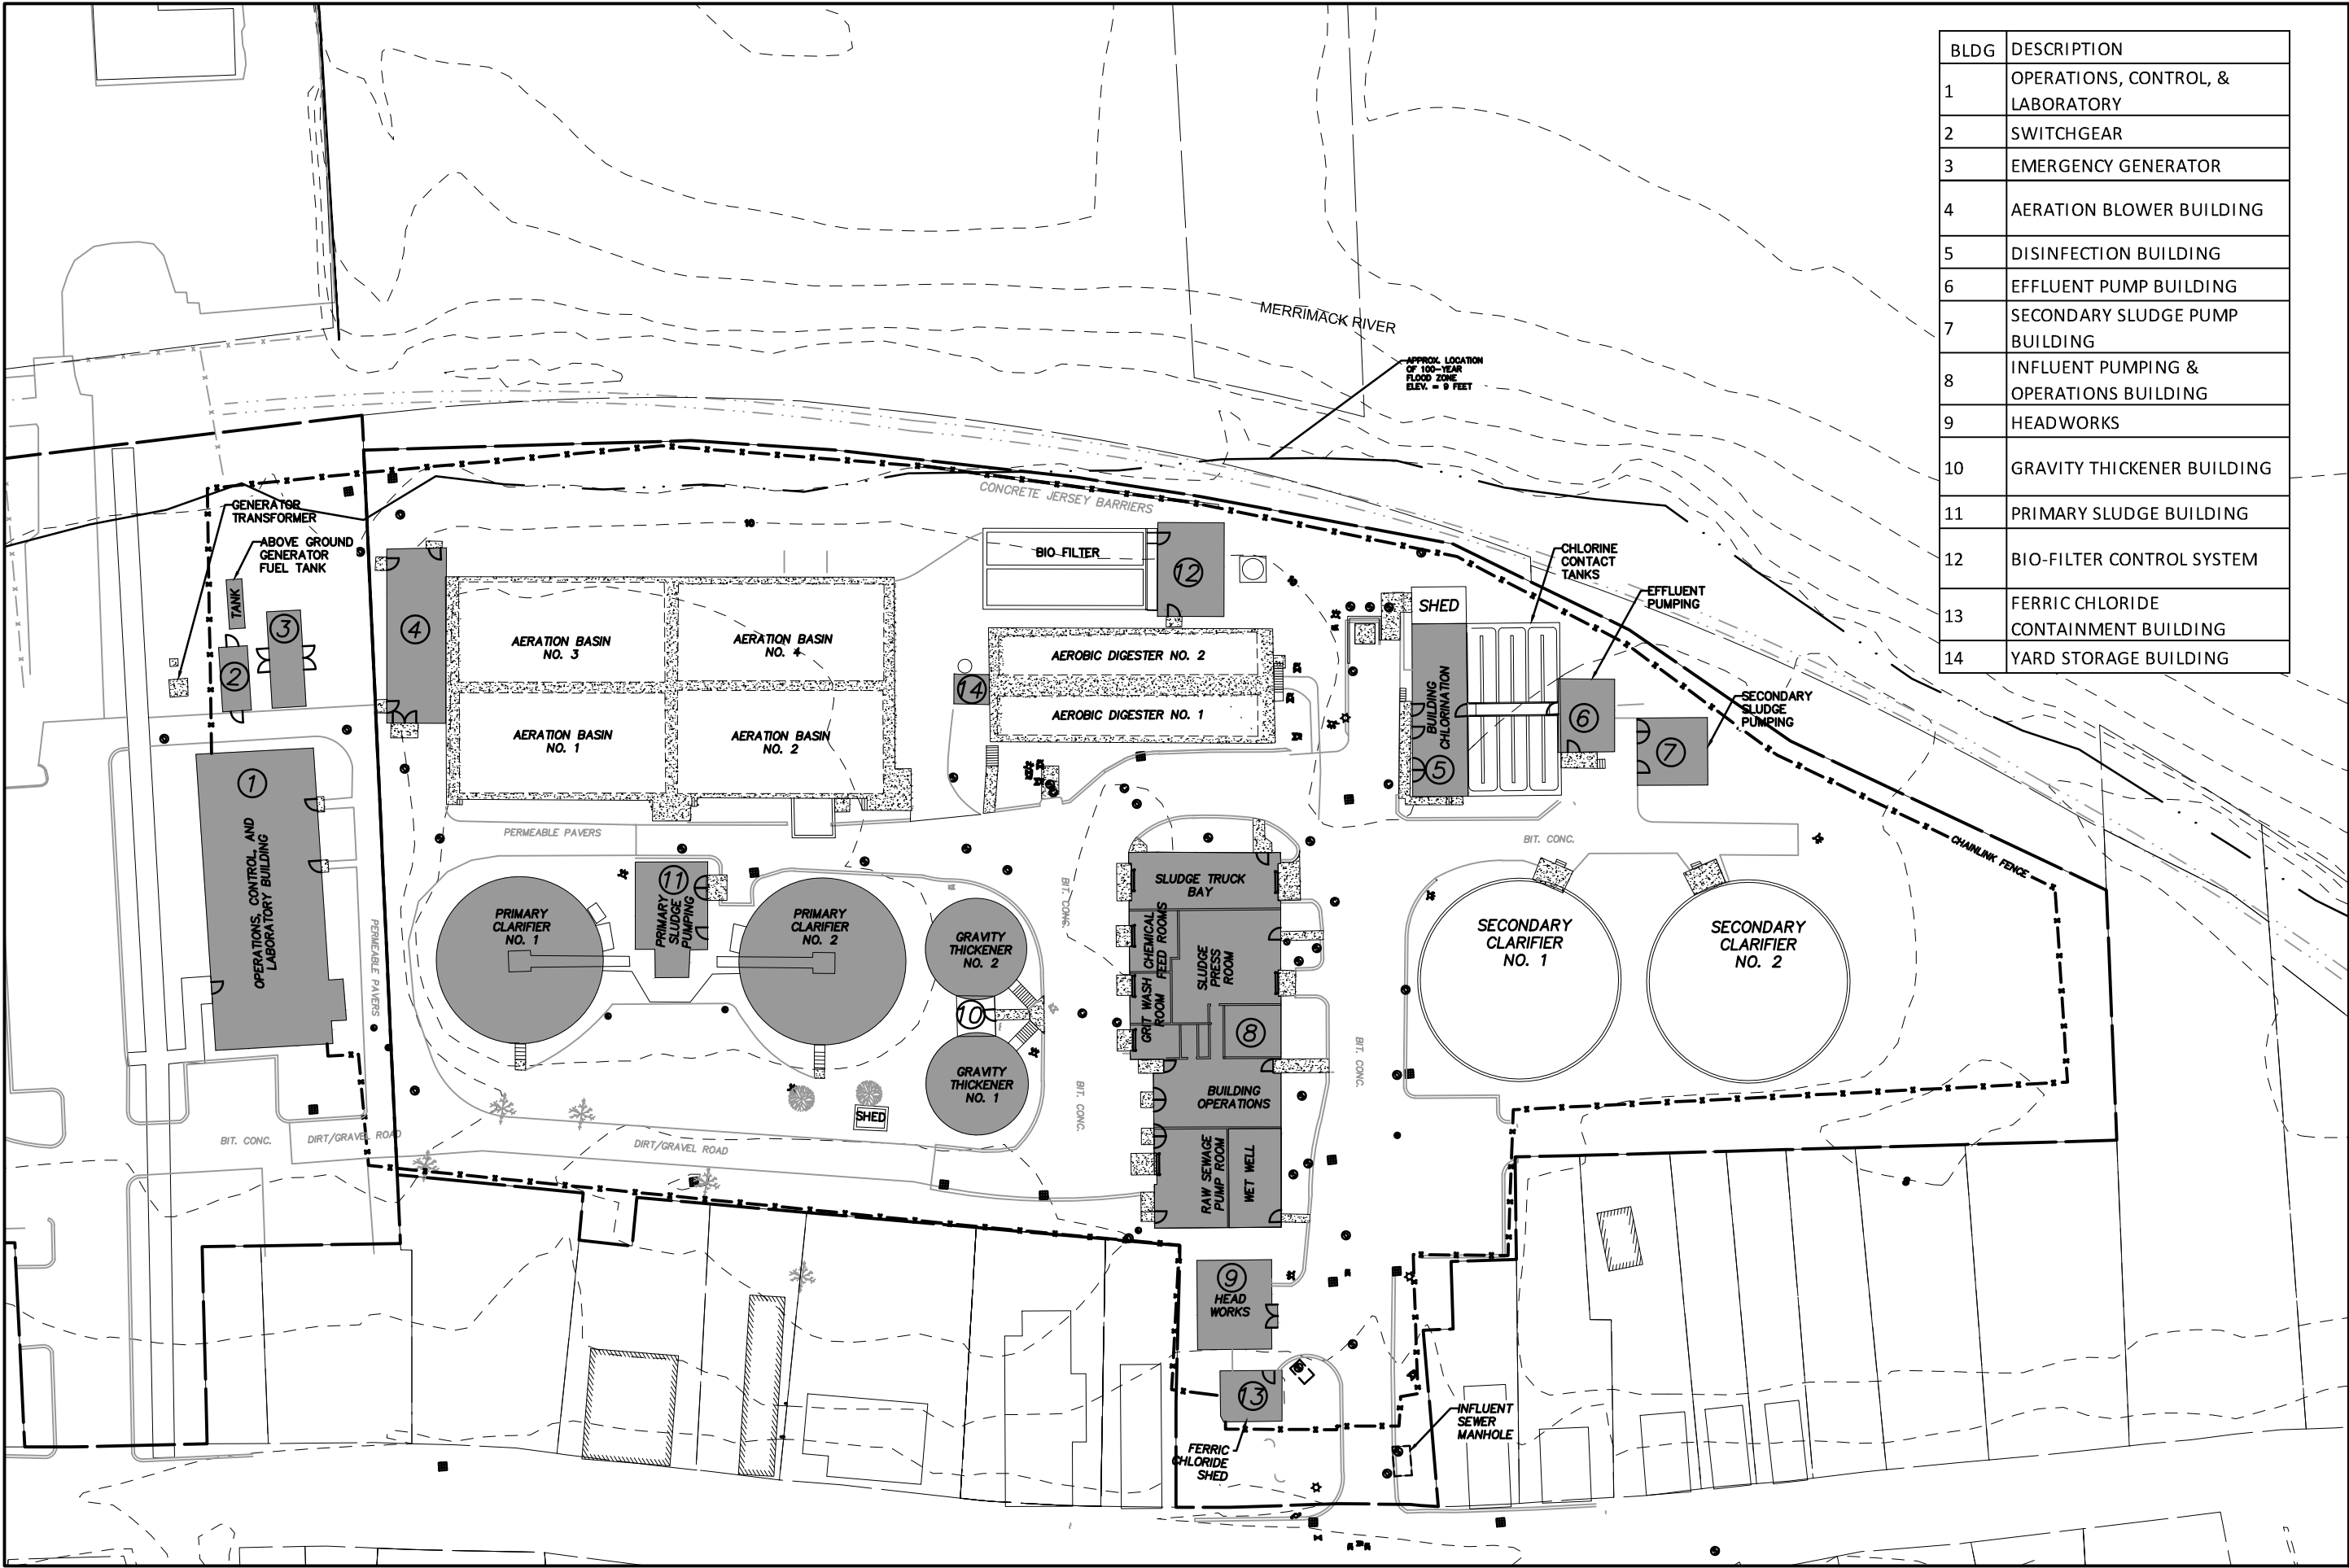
on the following page shows the layout of the Newburyport WWTP. It consists of 14 numbered buildings and 13 tanks including clarifiers and wastewater structures. Part of the facility is paved with porous pavement, while the rest of the property is grass or asphalt. The following Tables 3.1 and 3.2 highlight critical elevations of each asset as well as the age of the systems within the asset. Elevations presented in the task are based on the NAVD 88 datum.
